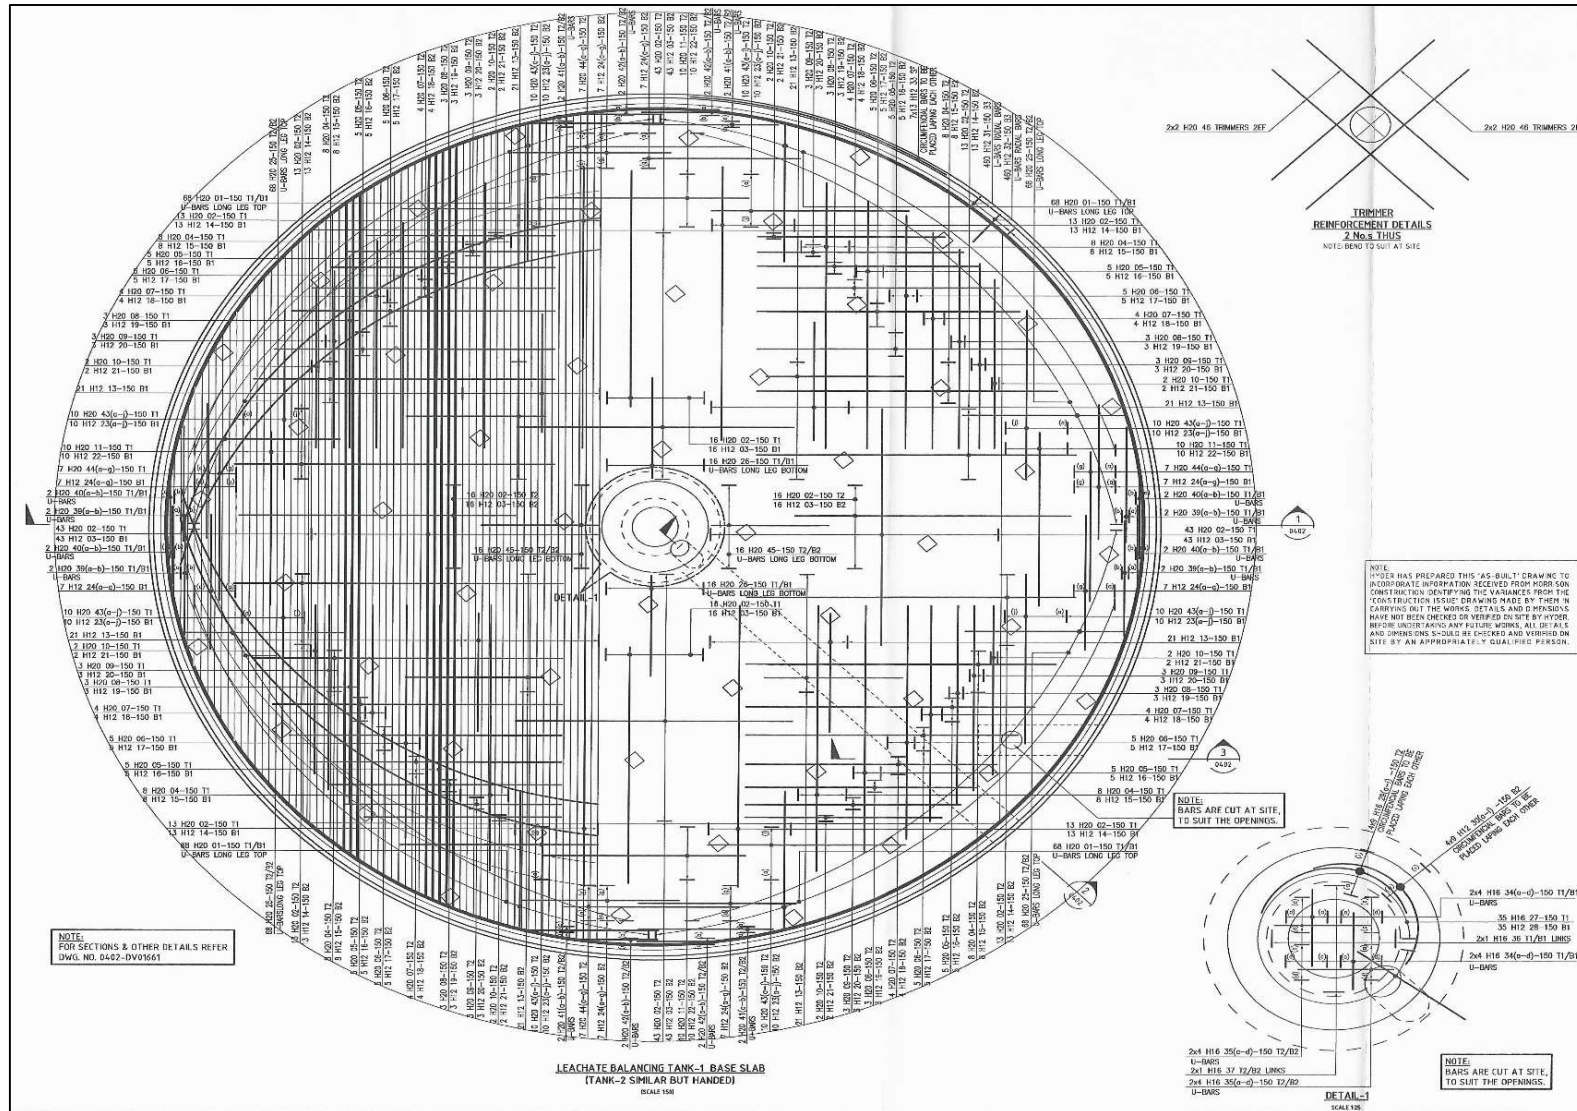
Layout of steel reinforcing for concrete base to the STORs
